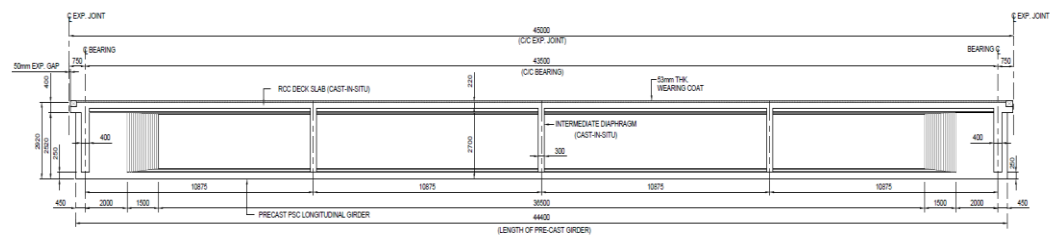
17 Elevation of 45m span OC post tensioned I girder
